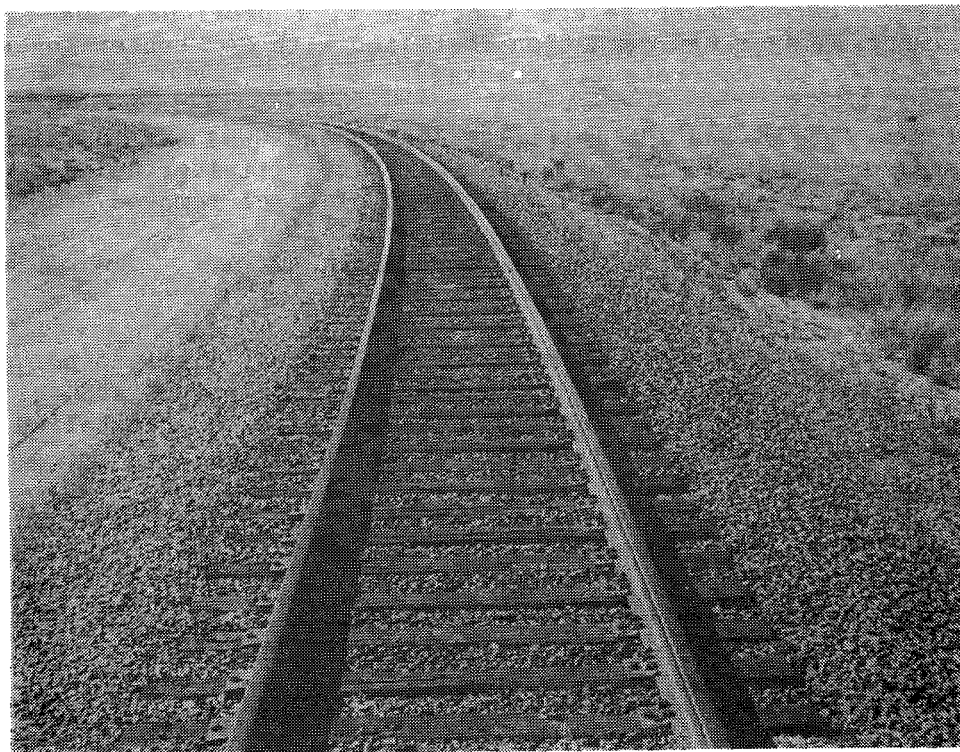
CONTINUOUS WELDED RAIL (CWR) ON WOOD TIES.
